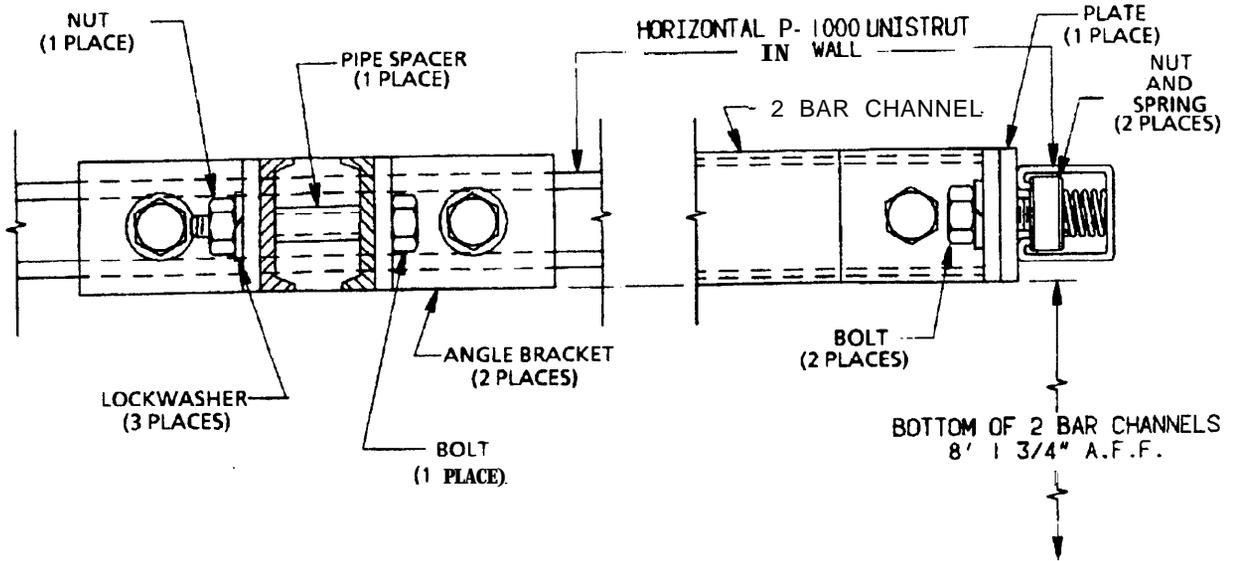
Typical Two-Bar Channel to Wall Support (UNISTRUT).
